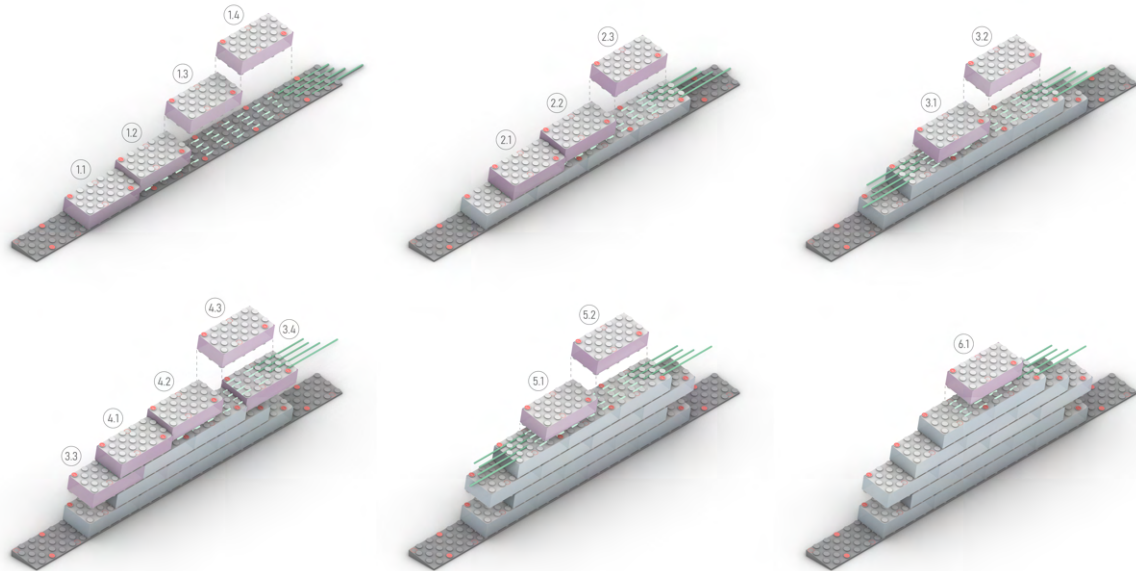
Assembly methods for locking demountable glass-interlayer components
